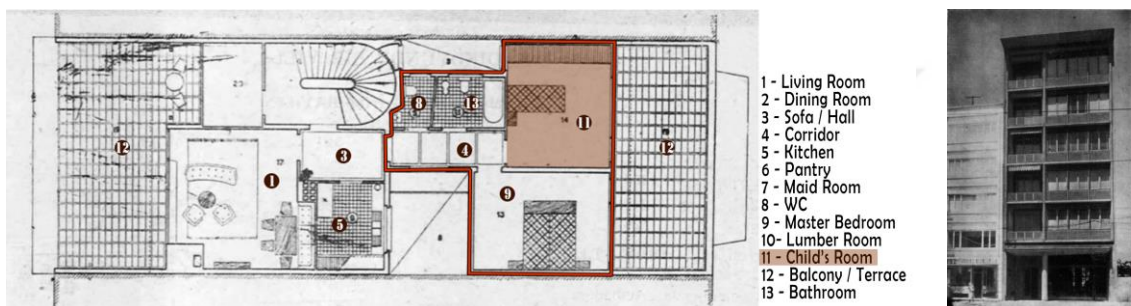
The attic floor plan of M.K. Apartment and a photograph (*Arkitekt*, 1957, 3)
